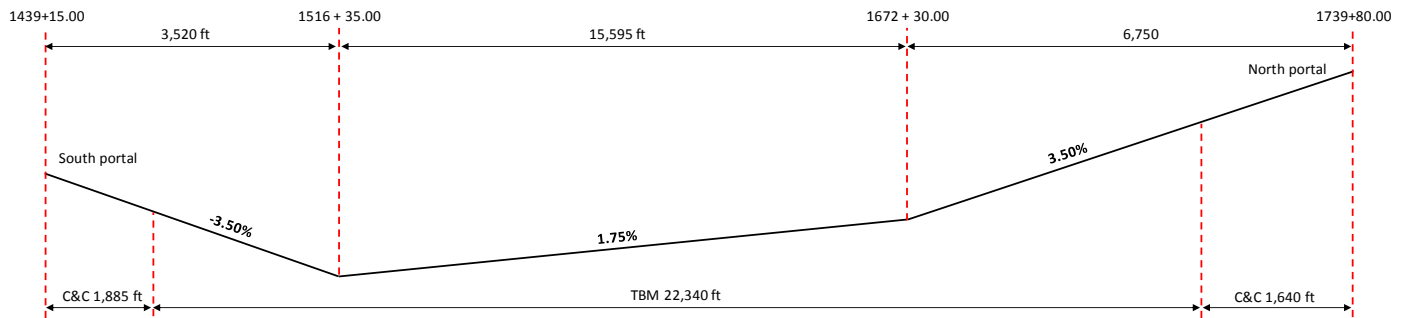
Longitudinal Section, North-Bound Lower Deck
